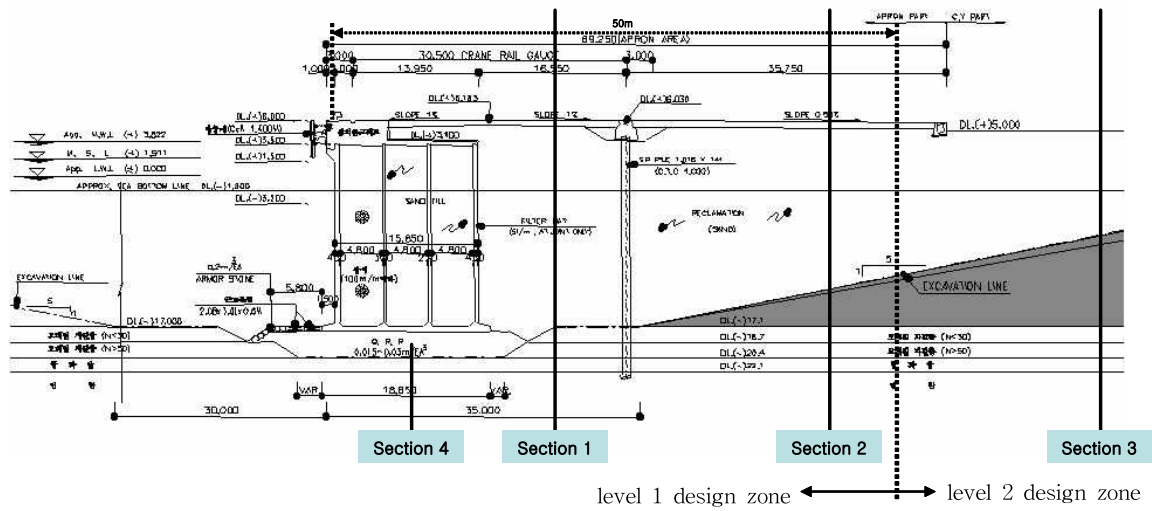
Gravity type quay wall (location : Jeolla-Namdo, KwangYang)
